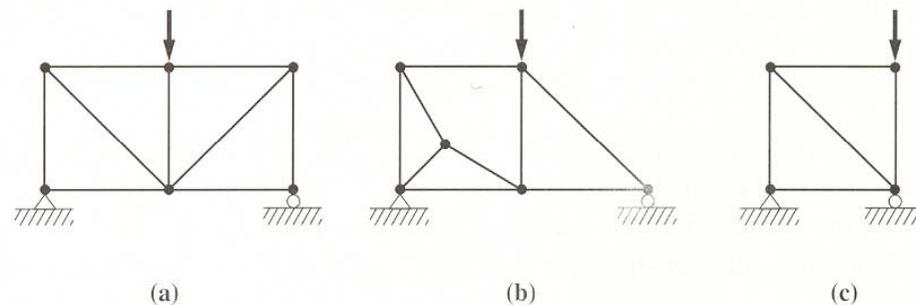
Examples of statically determinate, minimally stable trusses.
